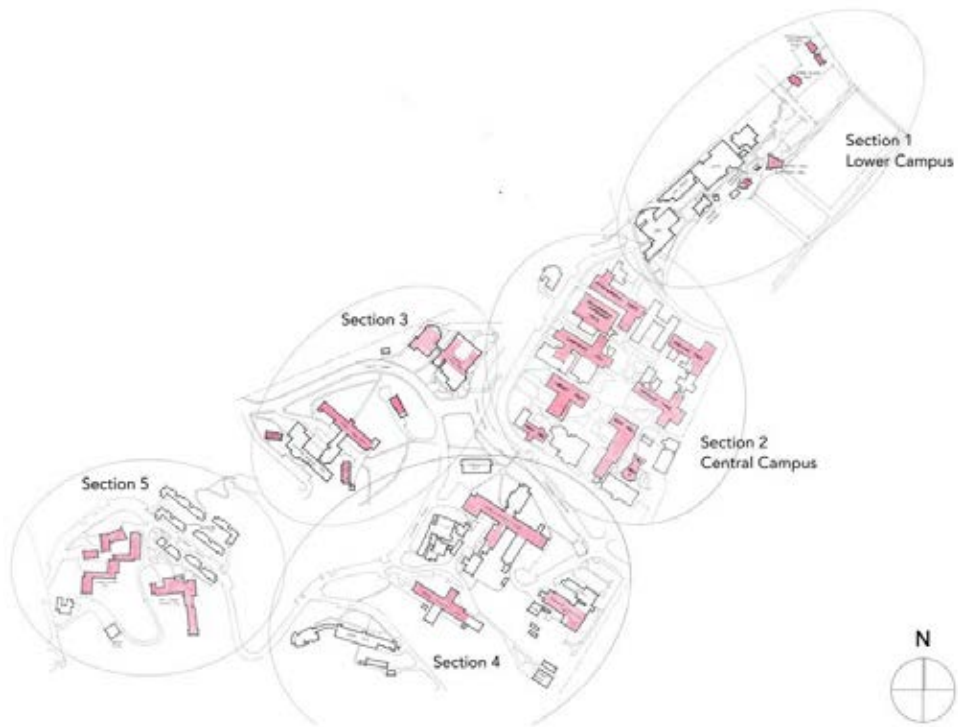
Site plan showing buildings built up to 1969 overlaid on current Site layout. The following figures provide enlarged views of sections 1-5. Source: Paul Davies Pty Ltd
